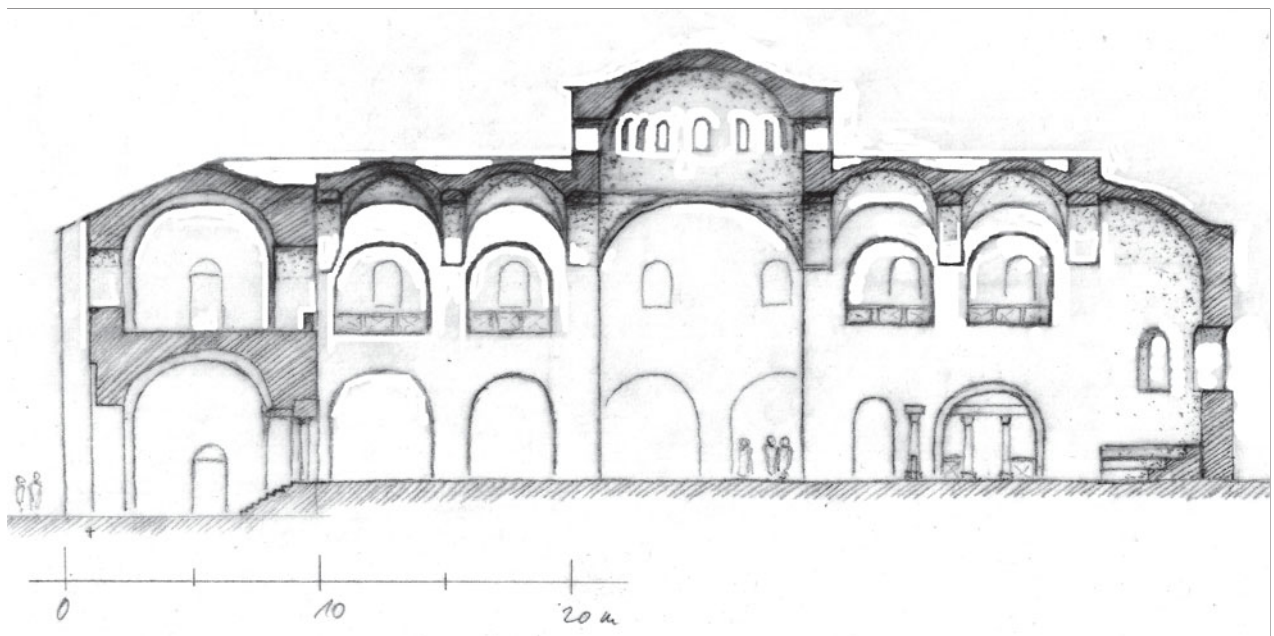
Germia, Church of St Michael: phase three, reconstructed longitudinal section looking north. Cf. fig. 56
